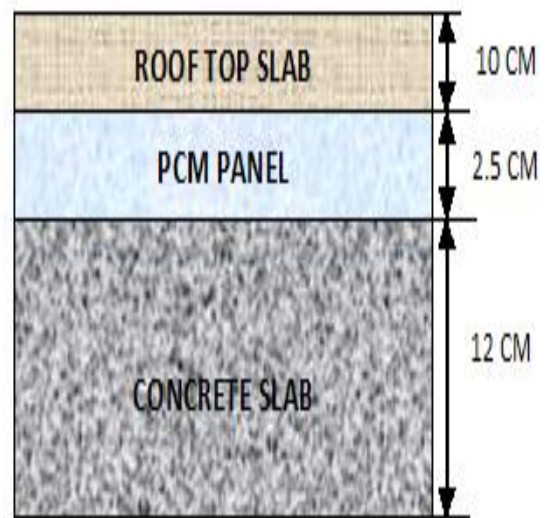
Concrete slab with rooftop finish piece with single layer PCM.
